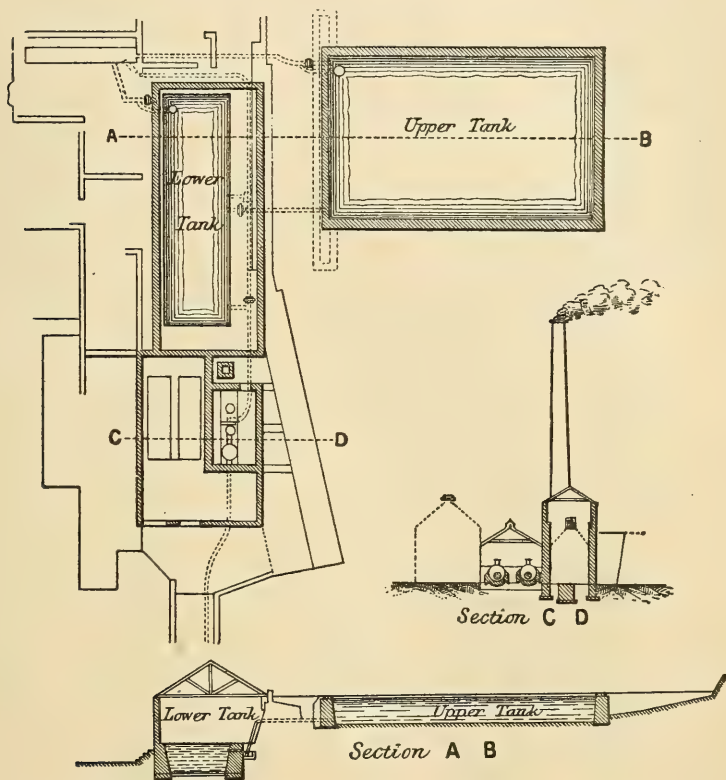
General Arrangement of Tanks, Engine and Boiler Houses, Berwick-on-Tweed Water-works.
